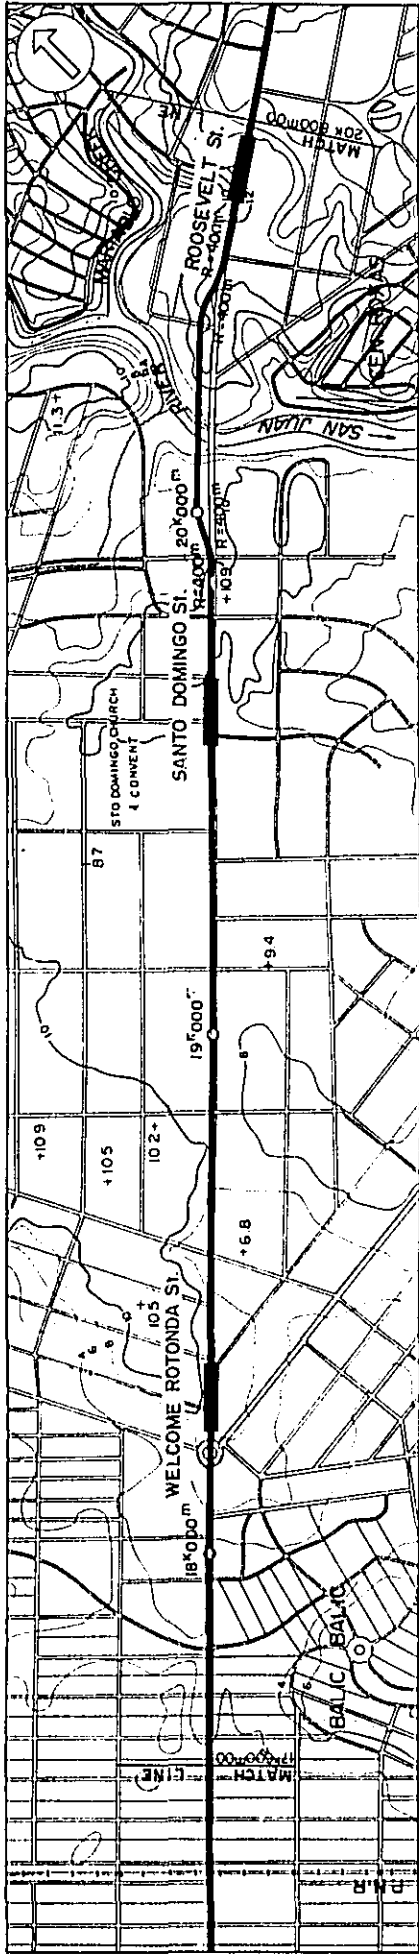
Plan and Profile for Elevation of Taft Avenue (3)
